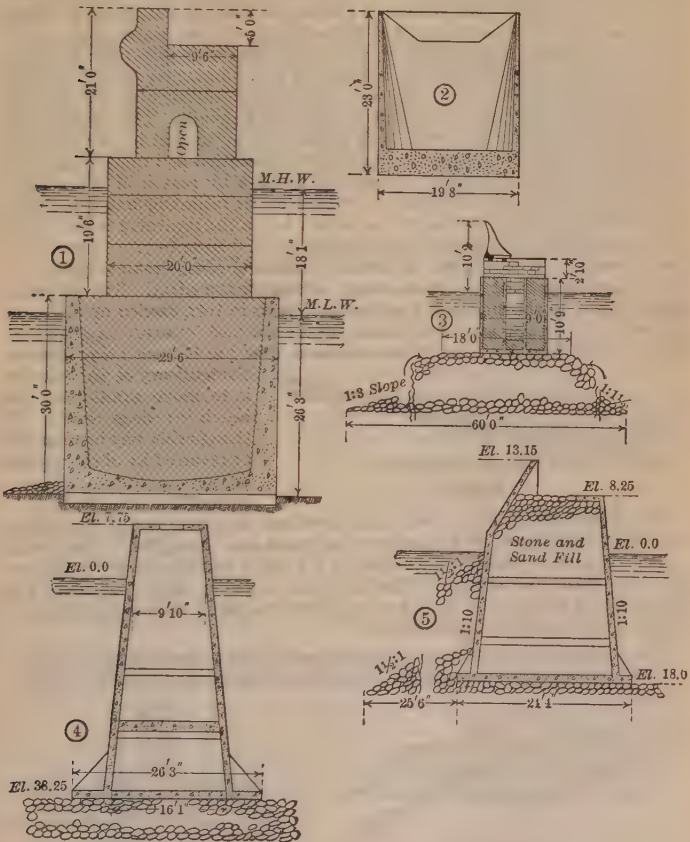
Reinforced-concrete Floating Caisson Breakwaters
